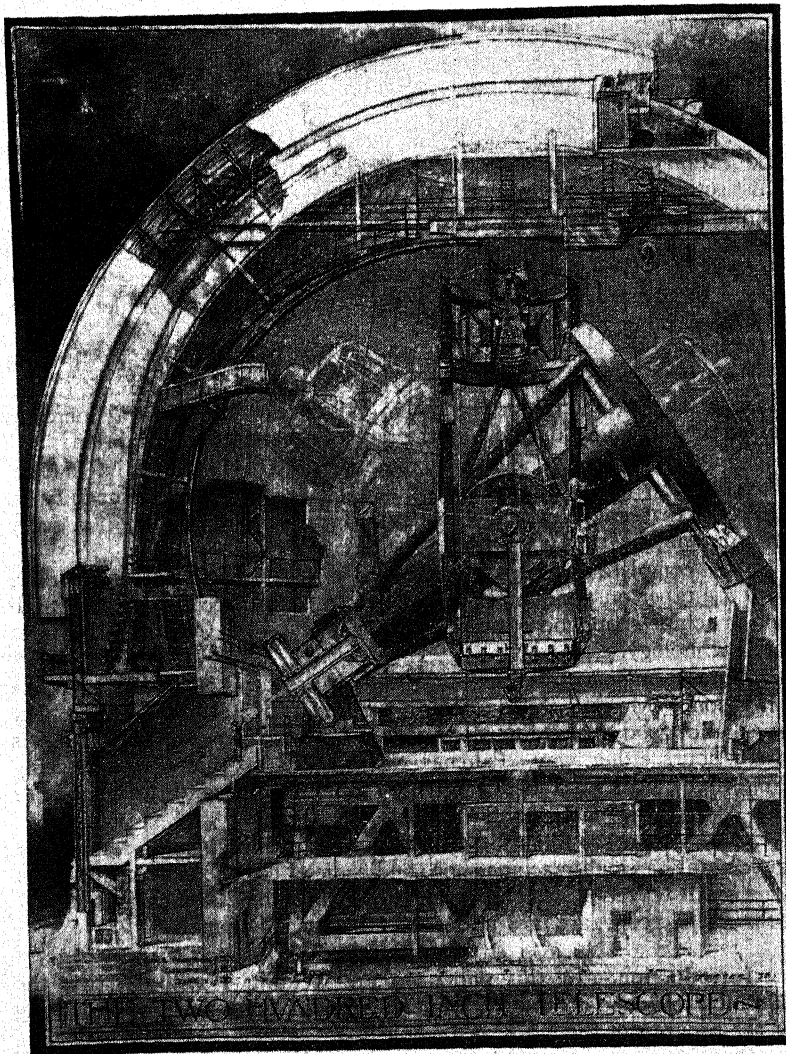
Cross section through big dome showing general arrangement and the 200-inch telescope.
